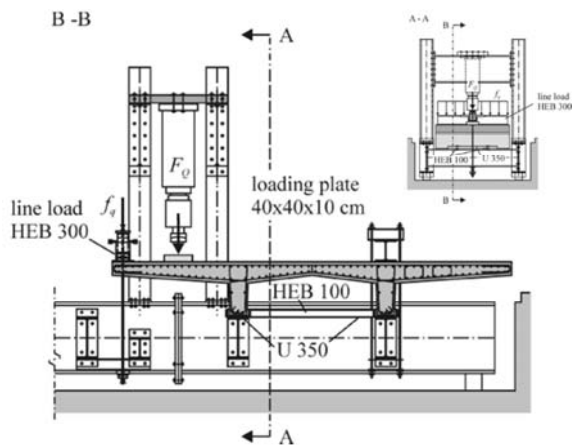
Test setup and load arrangement of the cantilever tests [12]
